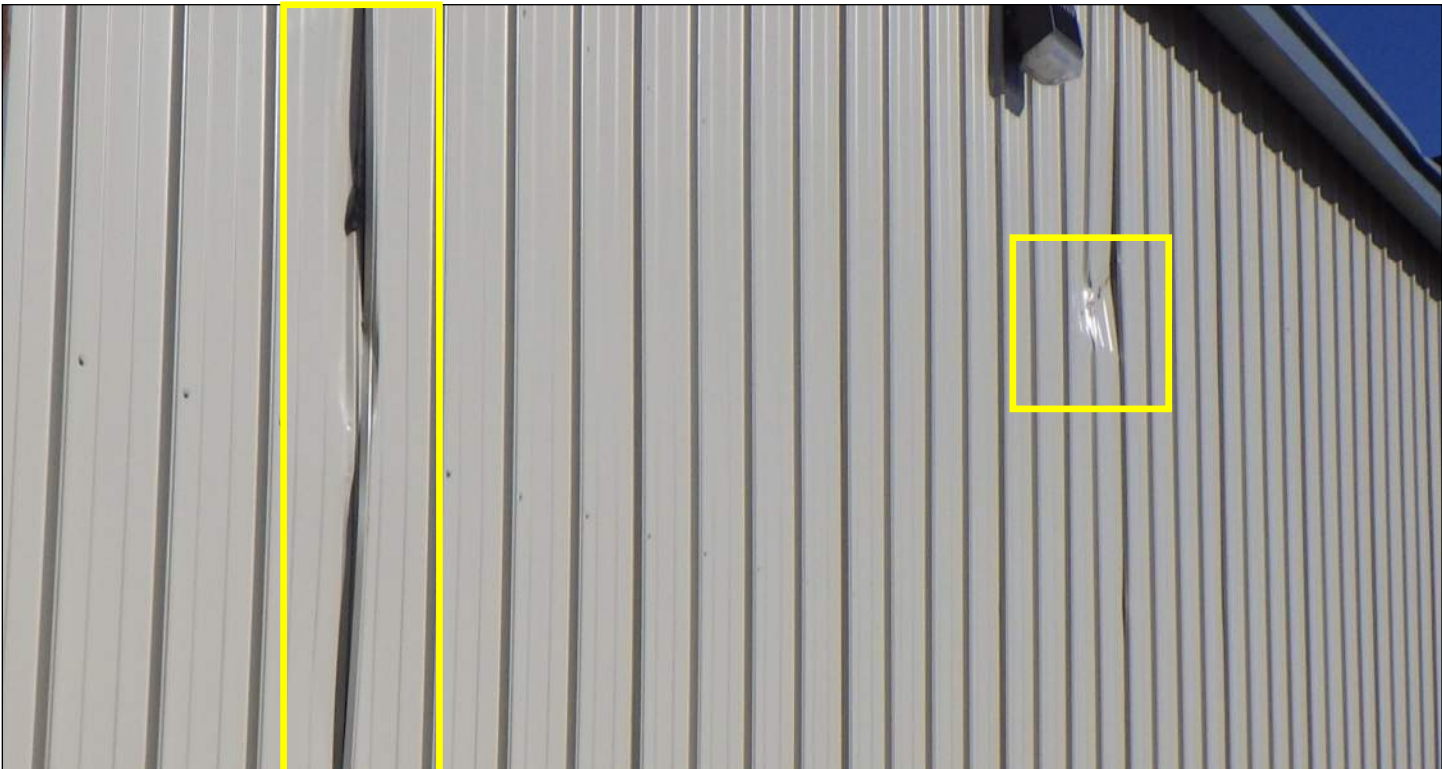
Scrapes, indentations, and punctures in siding panels on south elevation.
